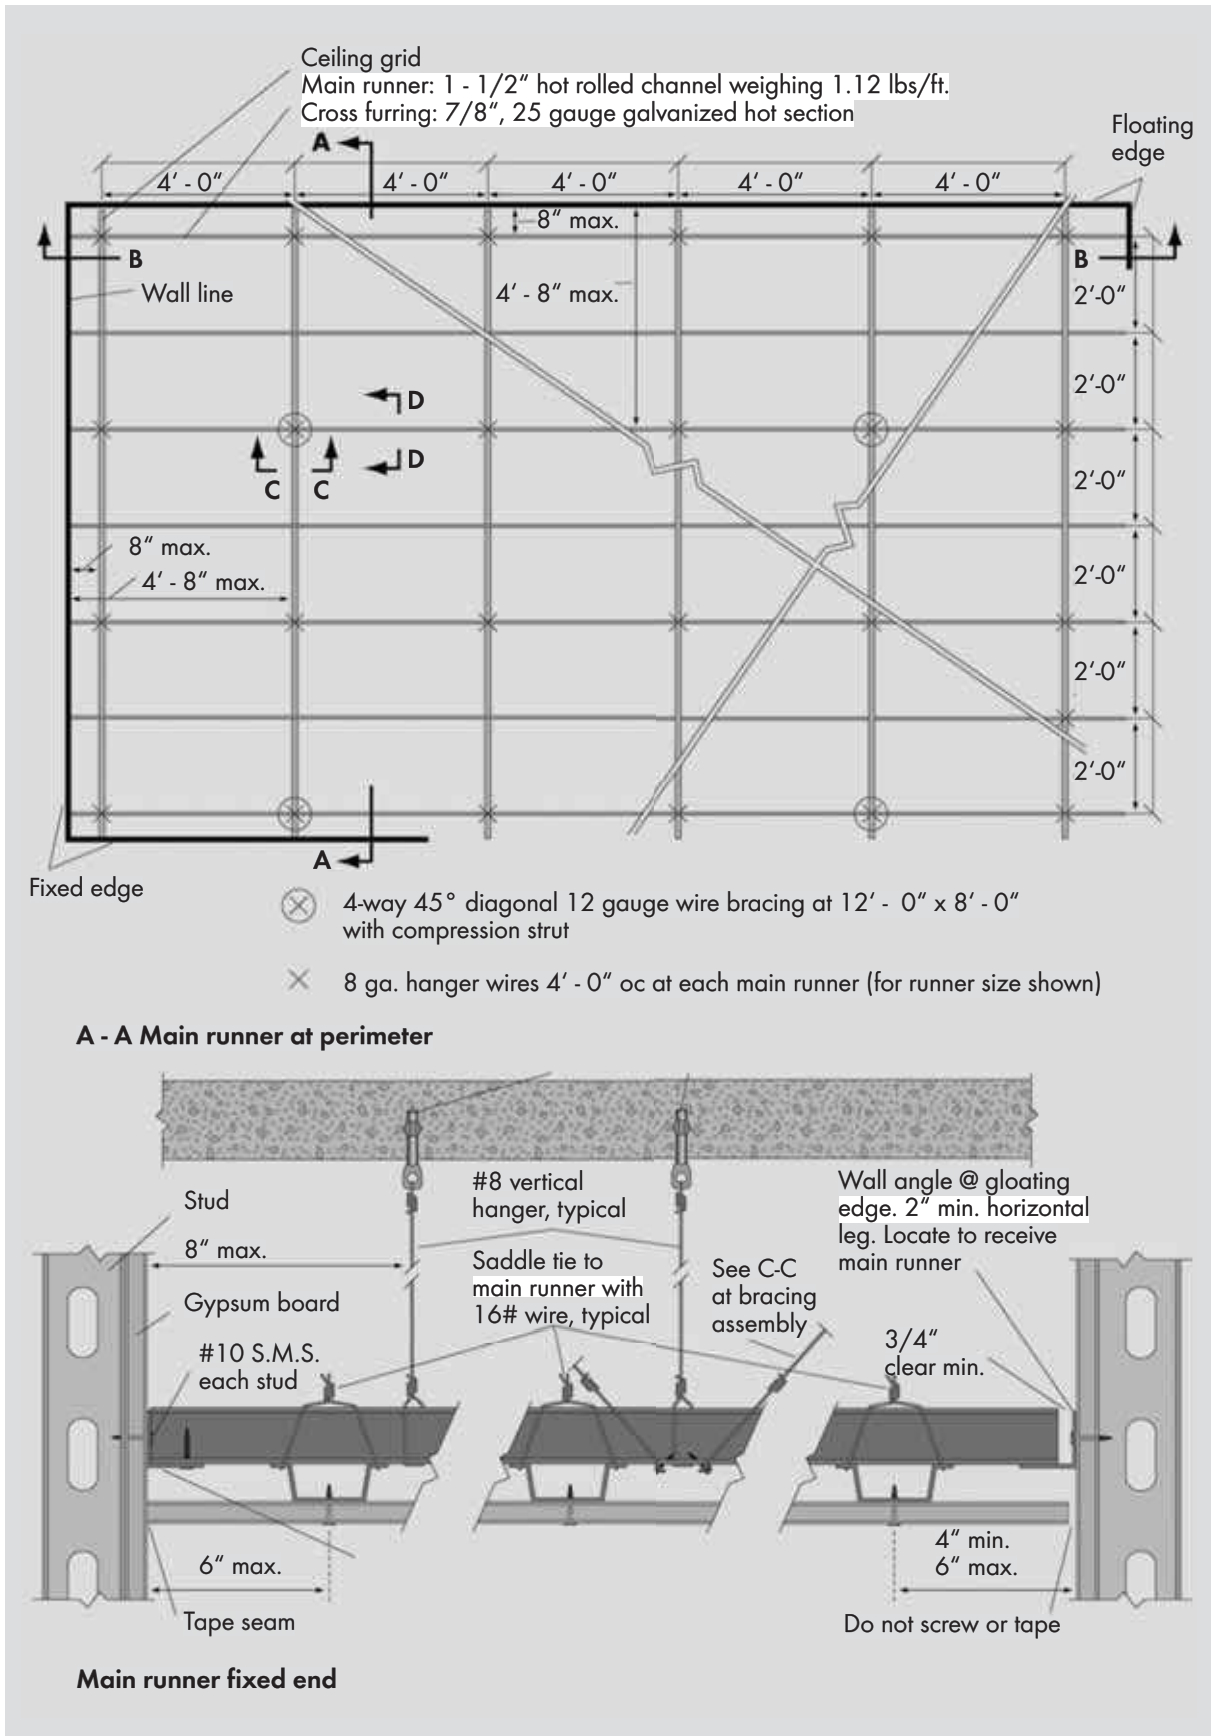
General layout, arrangement of typical seismic bracing assemblies and perimeter details for suspended lightweight gypsum board ceiling /FEMA E-74 (2011)/
